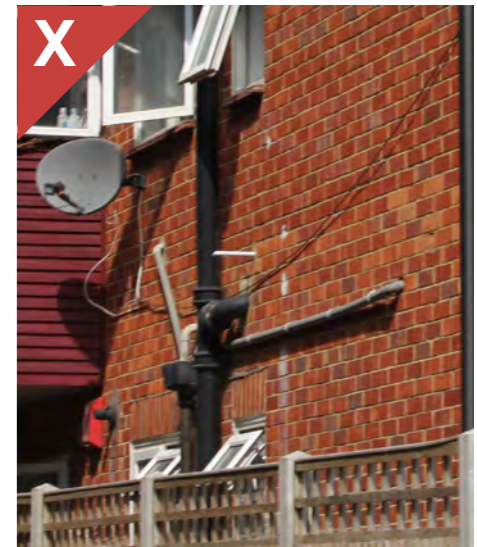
Poorly considered pipework on a side extension, visible from the street
